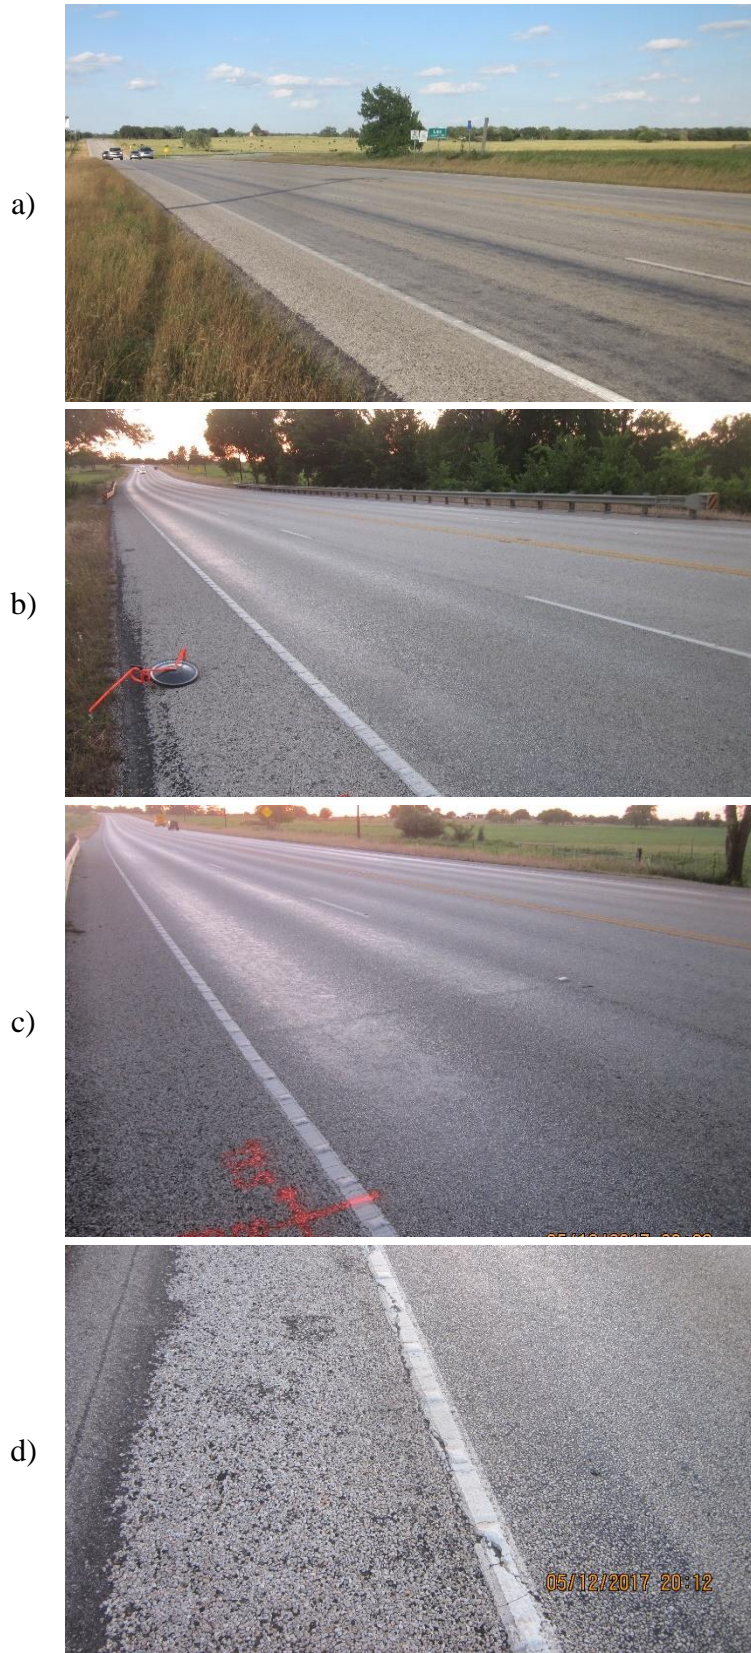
Example pictures from test sections at SH 21: a) Section 1; b) Section 4; c) Section 5; d) Section 3
